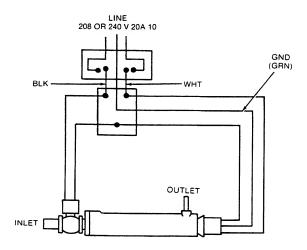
WATER JACKET MECHANICAL AND ELECTRICAL INSTALLATION.
